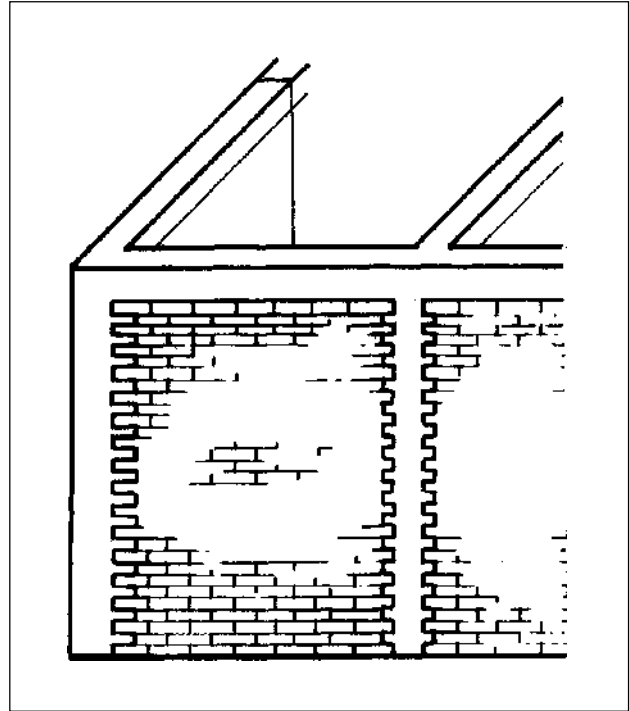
shows a similar system, developed by the University of the Andes, Mérida, Venezuela. The blocks have grooves and tongues which interlock. Horizontal ring beams of reinforced concrete are placed at a height of 1.20 m and on top of the wall.
